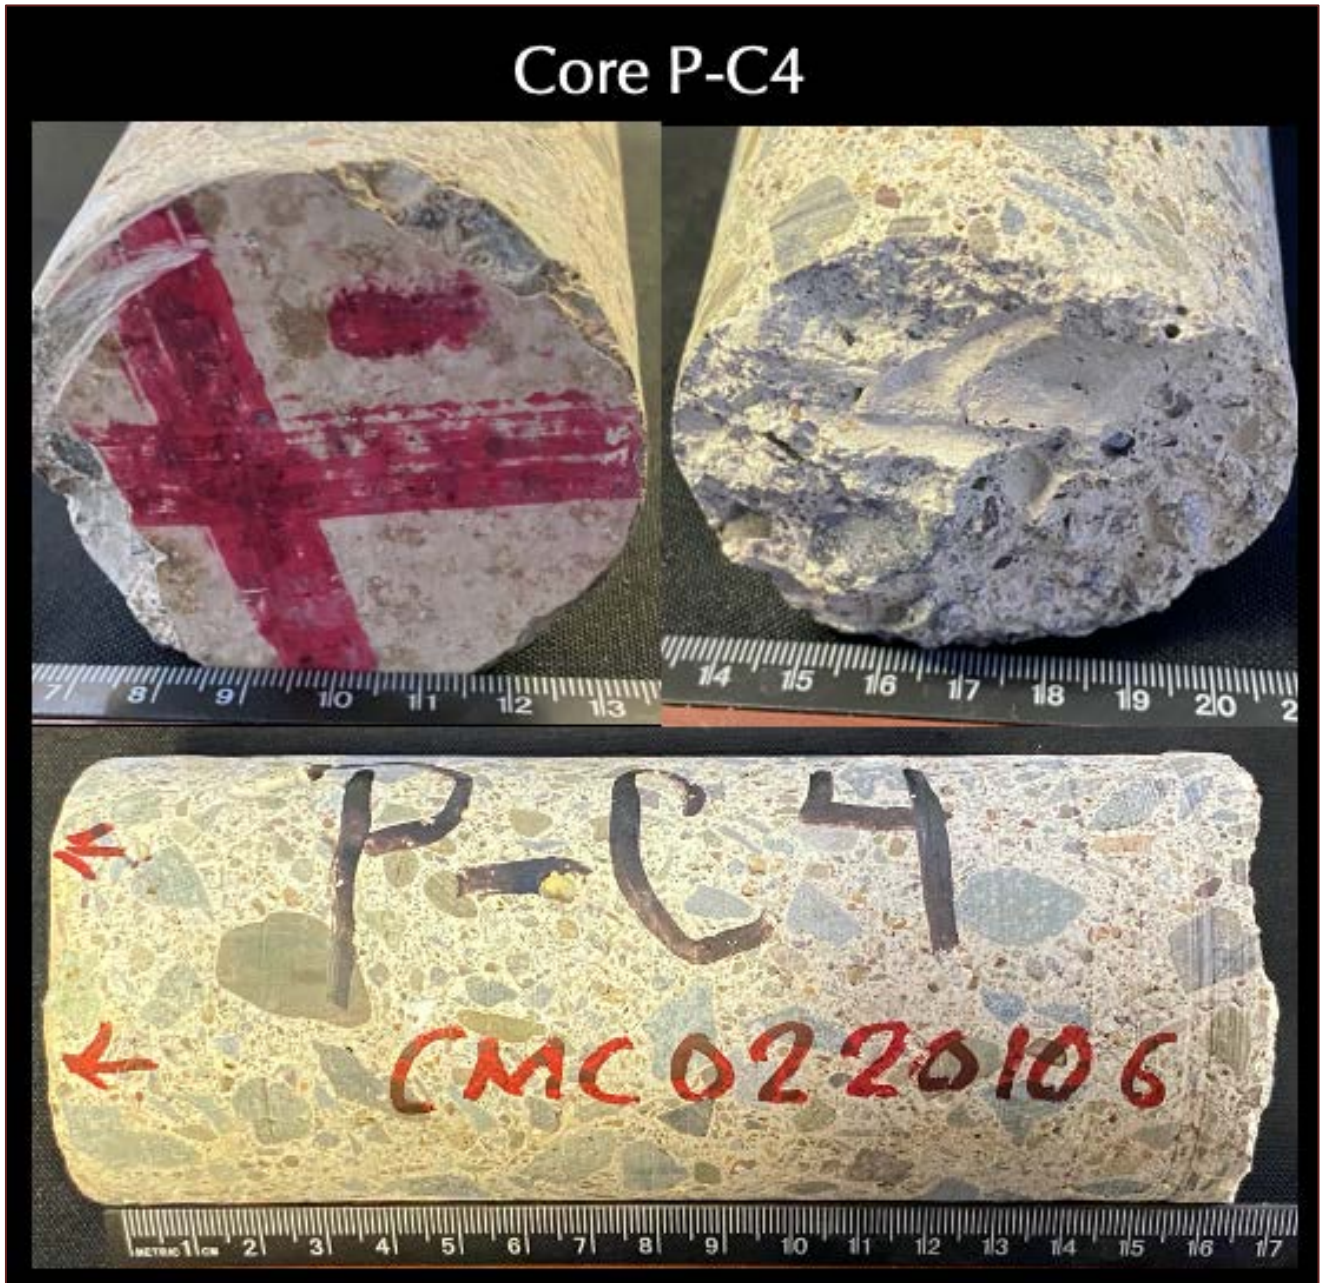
Shown are the exterior painted surface (top left), interior fractured end (top right) and side cylindrical surfaces of the Core P-C4 from PIT.
